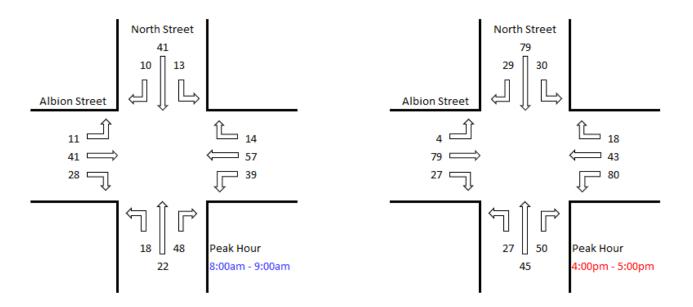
Albion Street / Lowes Mount Road / North Street Intersection Count
